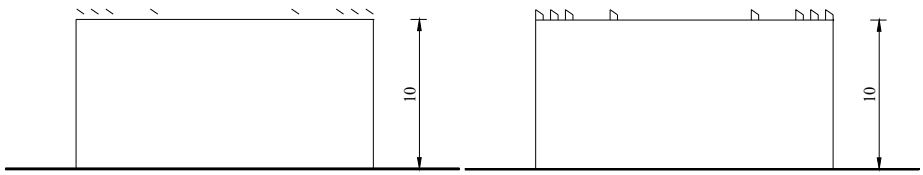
View of a wind tunnel model of a 10 metre high building, with solar energy systems with open substructure (left figure) and closed substructure (right figure)
